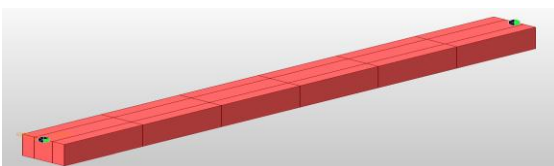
MIDAS model for Beam with Concrete Jacketing and Minimum Reinforcement
